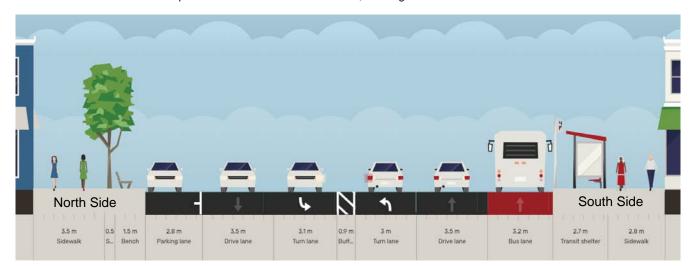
Option 2 Cross-section at John Street, Looking East
